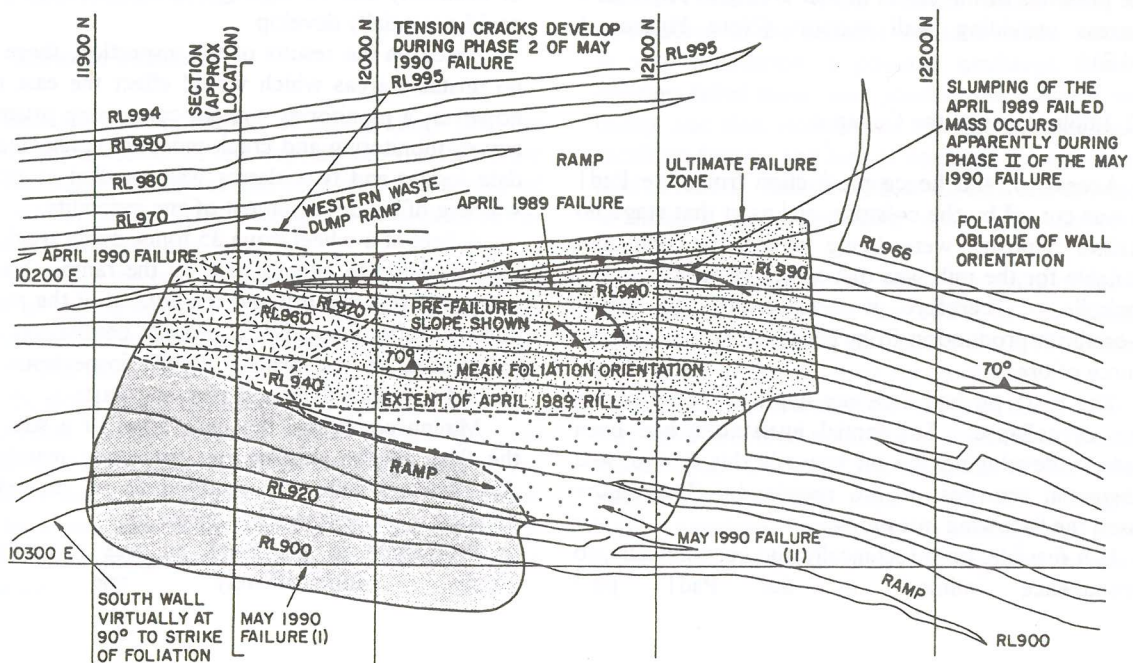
PLAN OF COLLAPSED WALL SHOWING EXTENT OF VARIOUS FAILURES
